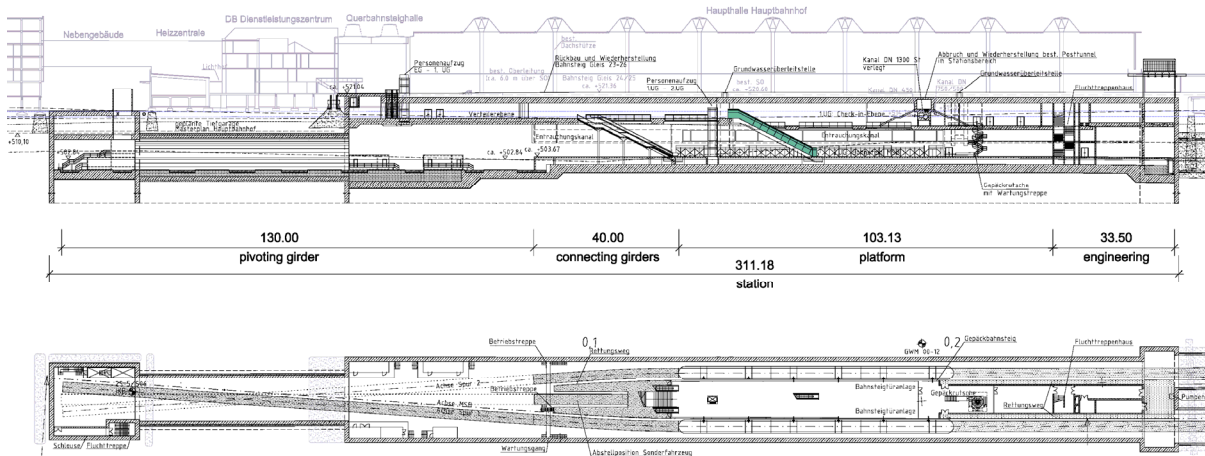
Pivoting girder for 3 and 4-section-vehicle at Munich Main Station
